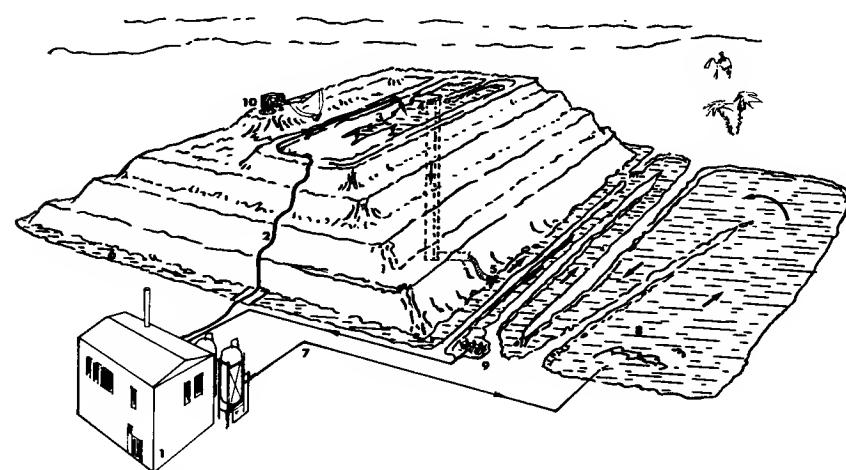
Gypsum pile and cooling pond arrangement. 1, Phosphoric acid unit; 2, gypsum slurry pipe; 3, operating settling pond; 4, outfall tower; 5, liquid flow into ditch; 6, surrounding ditch; 7, cooling water outflow pipe; 8, cooling pond; 9, pumping station to plant; 10, dragline.
